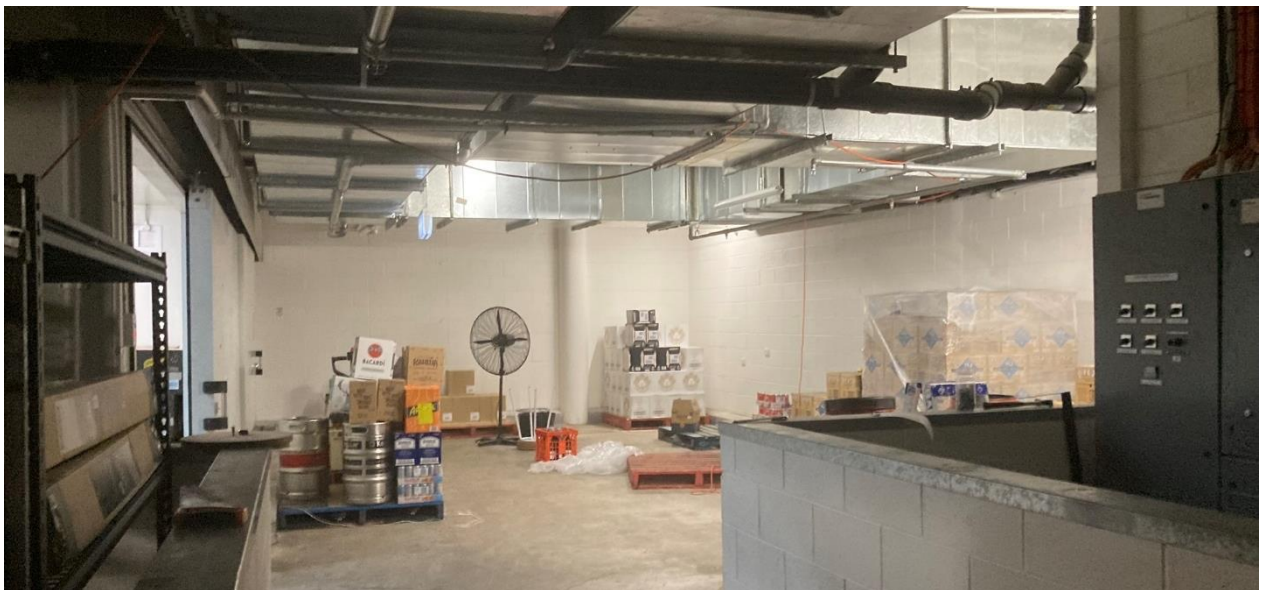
Stockroom proposed for installation of beer kegs. Refer to Figure 14 for location within the site.
